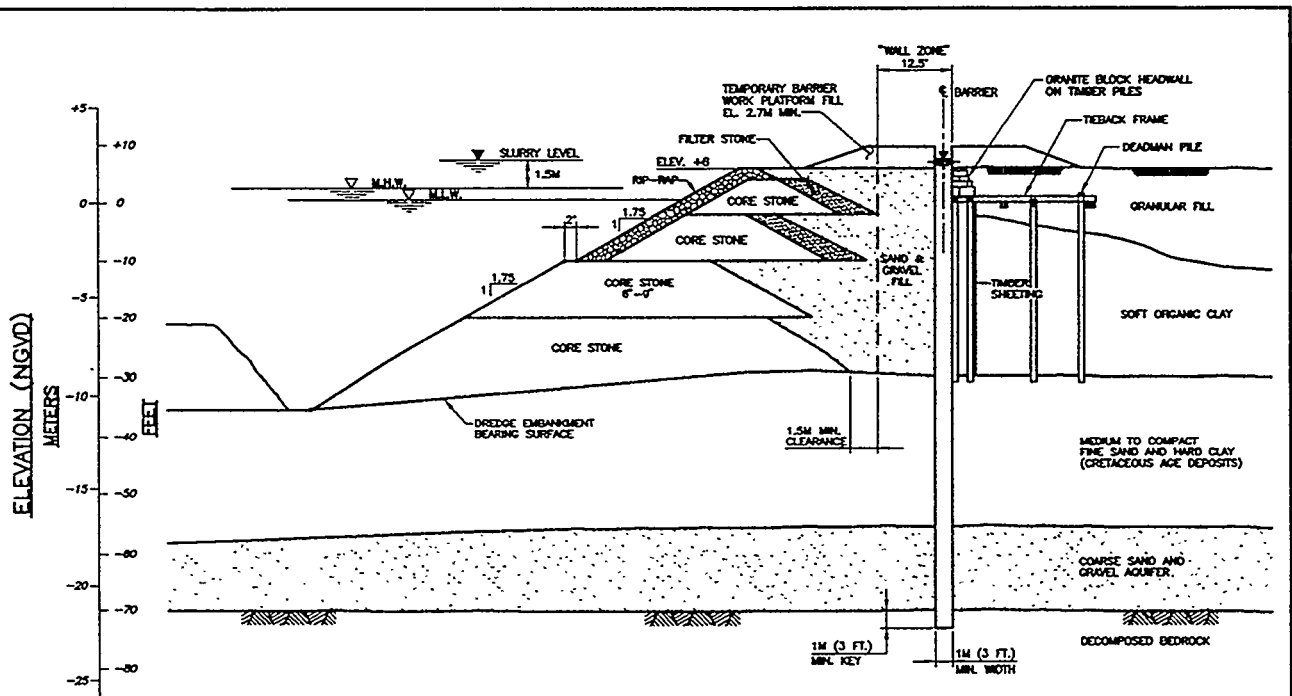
Bulkhead Circa 1860 and New Embankment With Active Slurry Trench Excavation
